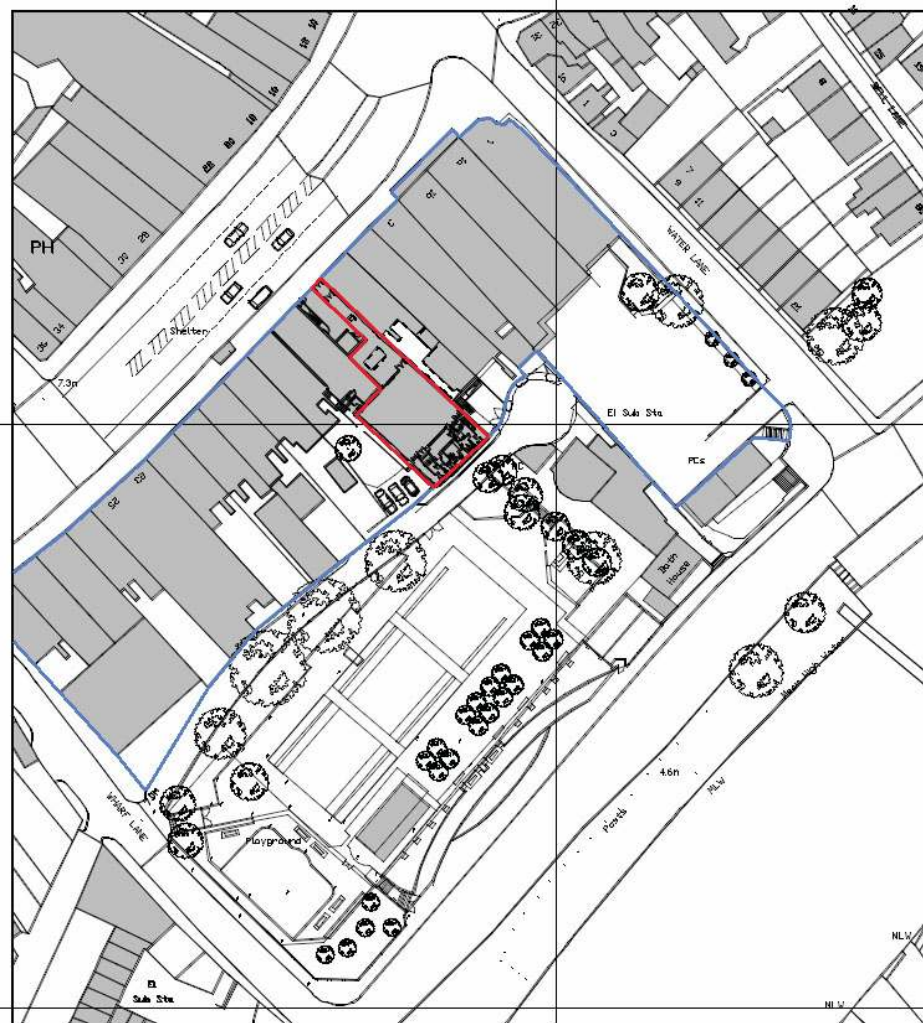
Plan of development site with *Queens Hall* outlined in red. Plan provided by FC Reit
